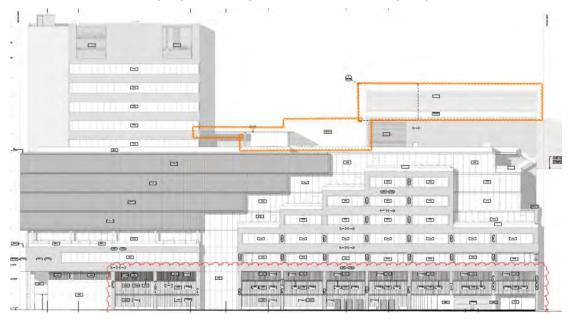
Marked up East Elevation (A30-1010) highlighting additions above the street wall with orange clouds
